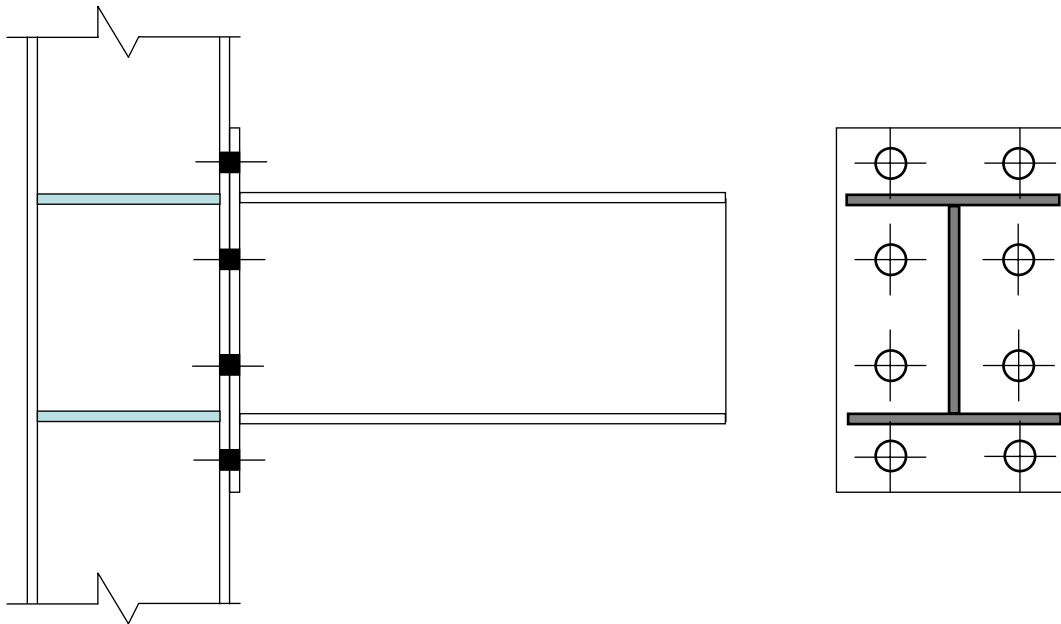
The detail of end-plate connection (4E, Four-bolt unstiffened type)
